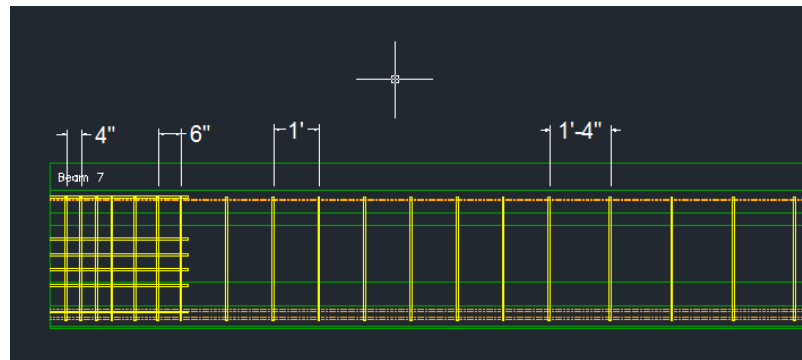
Stirrup locations for shear reinforcement provided by the Florida Department of Transportation (FDOT)
